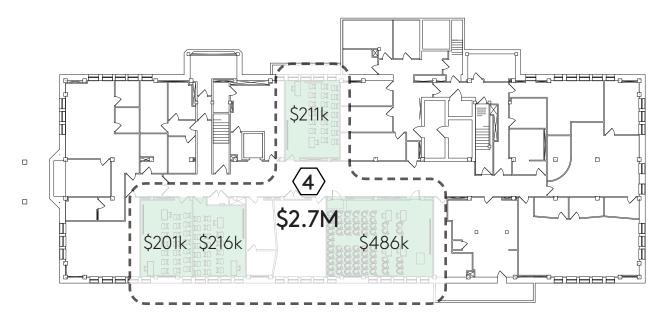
Phasing options overlaid on Raitt Hall floor plans
